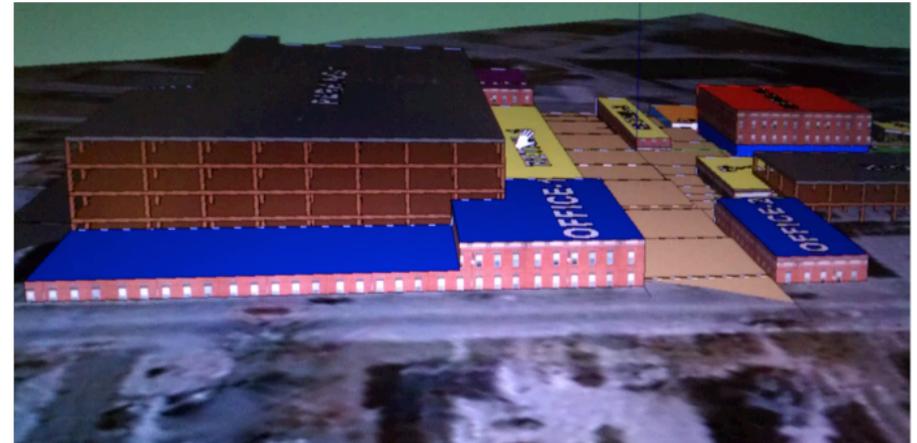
The two Office Buildings will be built in Phase-II and will have Main Street Frontage.
